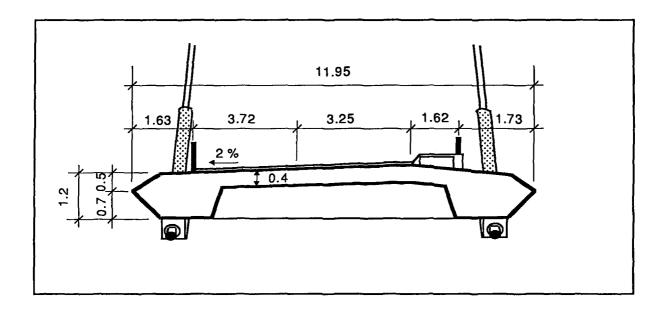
CROSS SECTION OF THE BRIDGE DECK (In meters)
